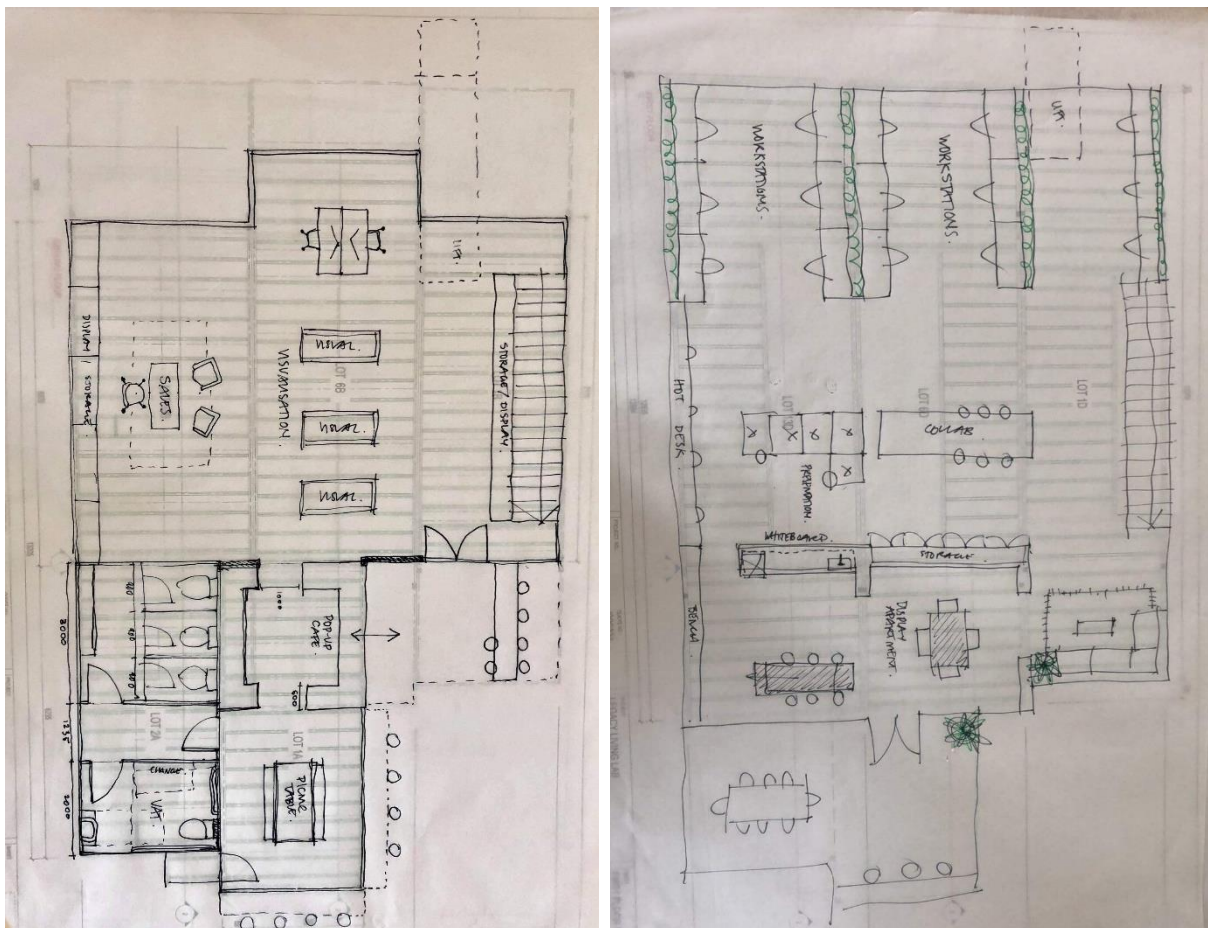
The close to final design sketches by Emma Whettingsteel to determine the internal space definition of L3 (note the sketches over a plan view of the structural steel from Figure 20(b))
